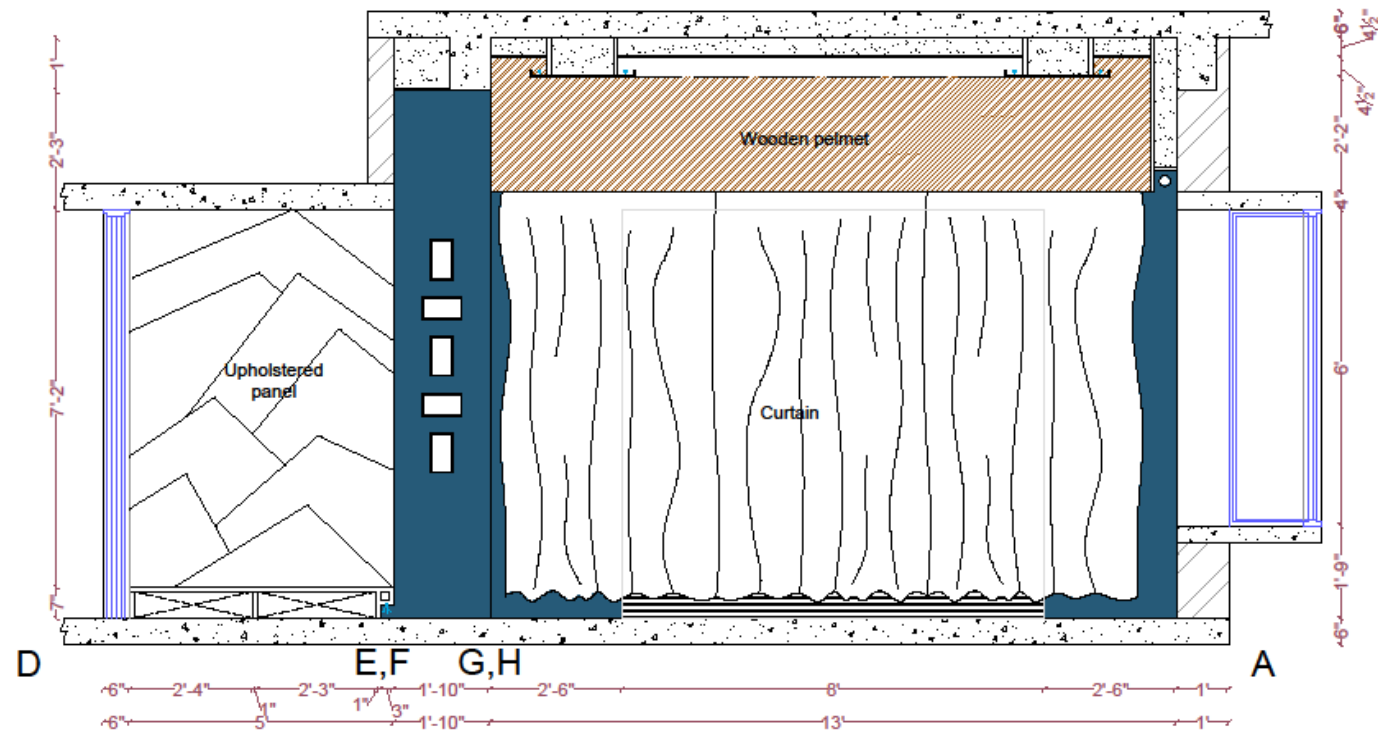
PROPOSED WALL ELEVATIONS CD, EF, GH (option -1)
